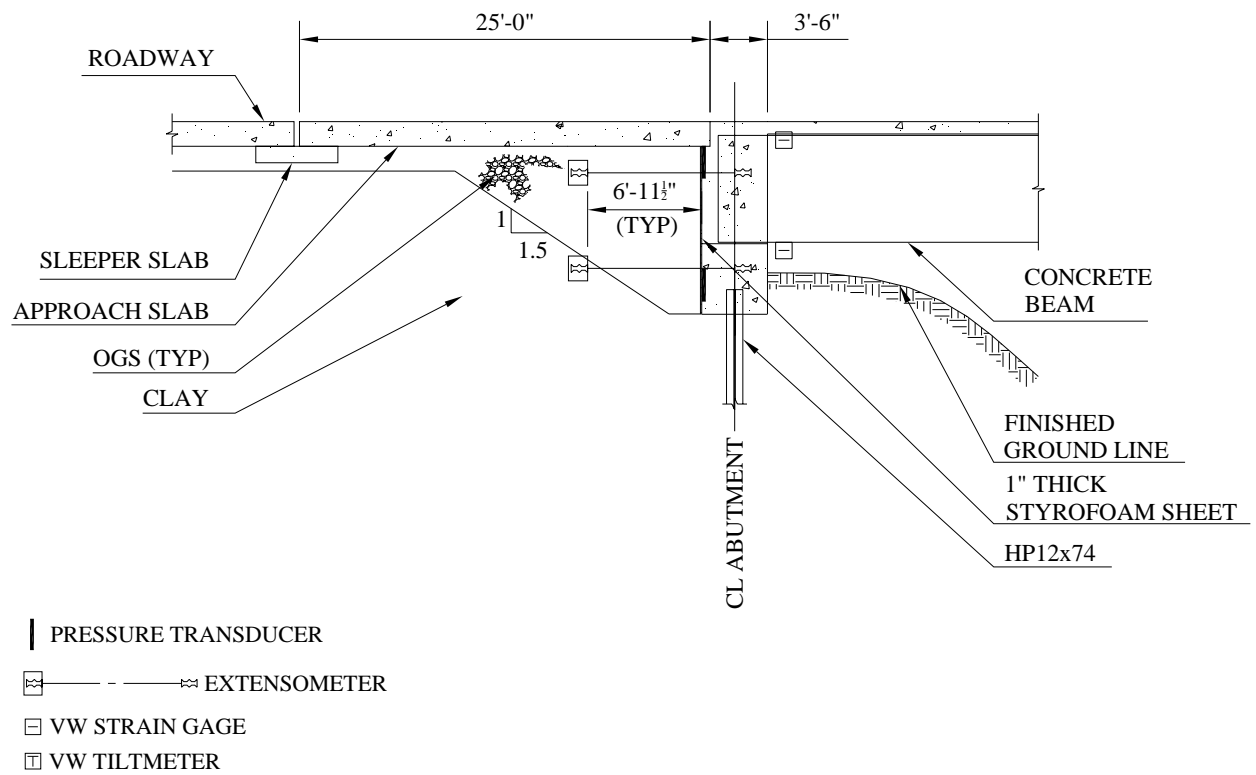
Bridge 109 Cross-Section through North Abutment (Section A-A).
